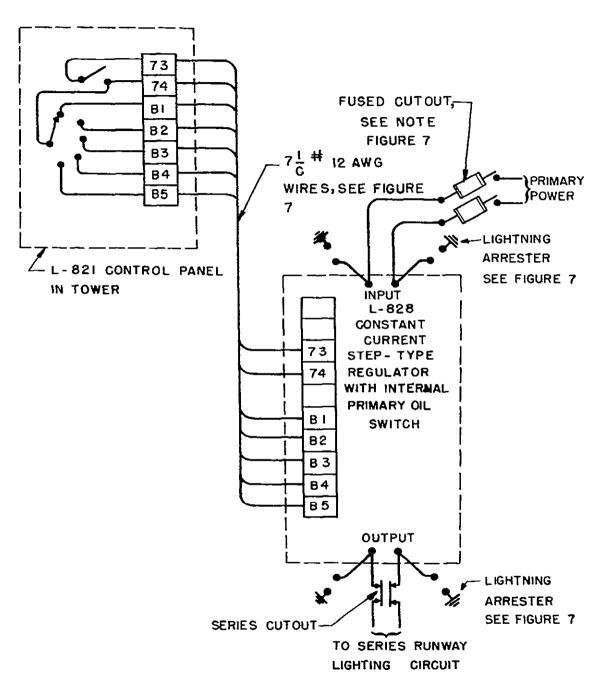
TYPICAL HIRL WIRING DIAGRAM UTILIZAING L-828 STEP-TYPE REGULATOR WITH INTERNAL CONTROL POWER AND PRIMARY OIL SWITCH
